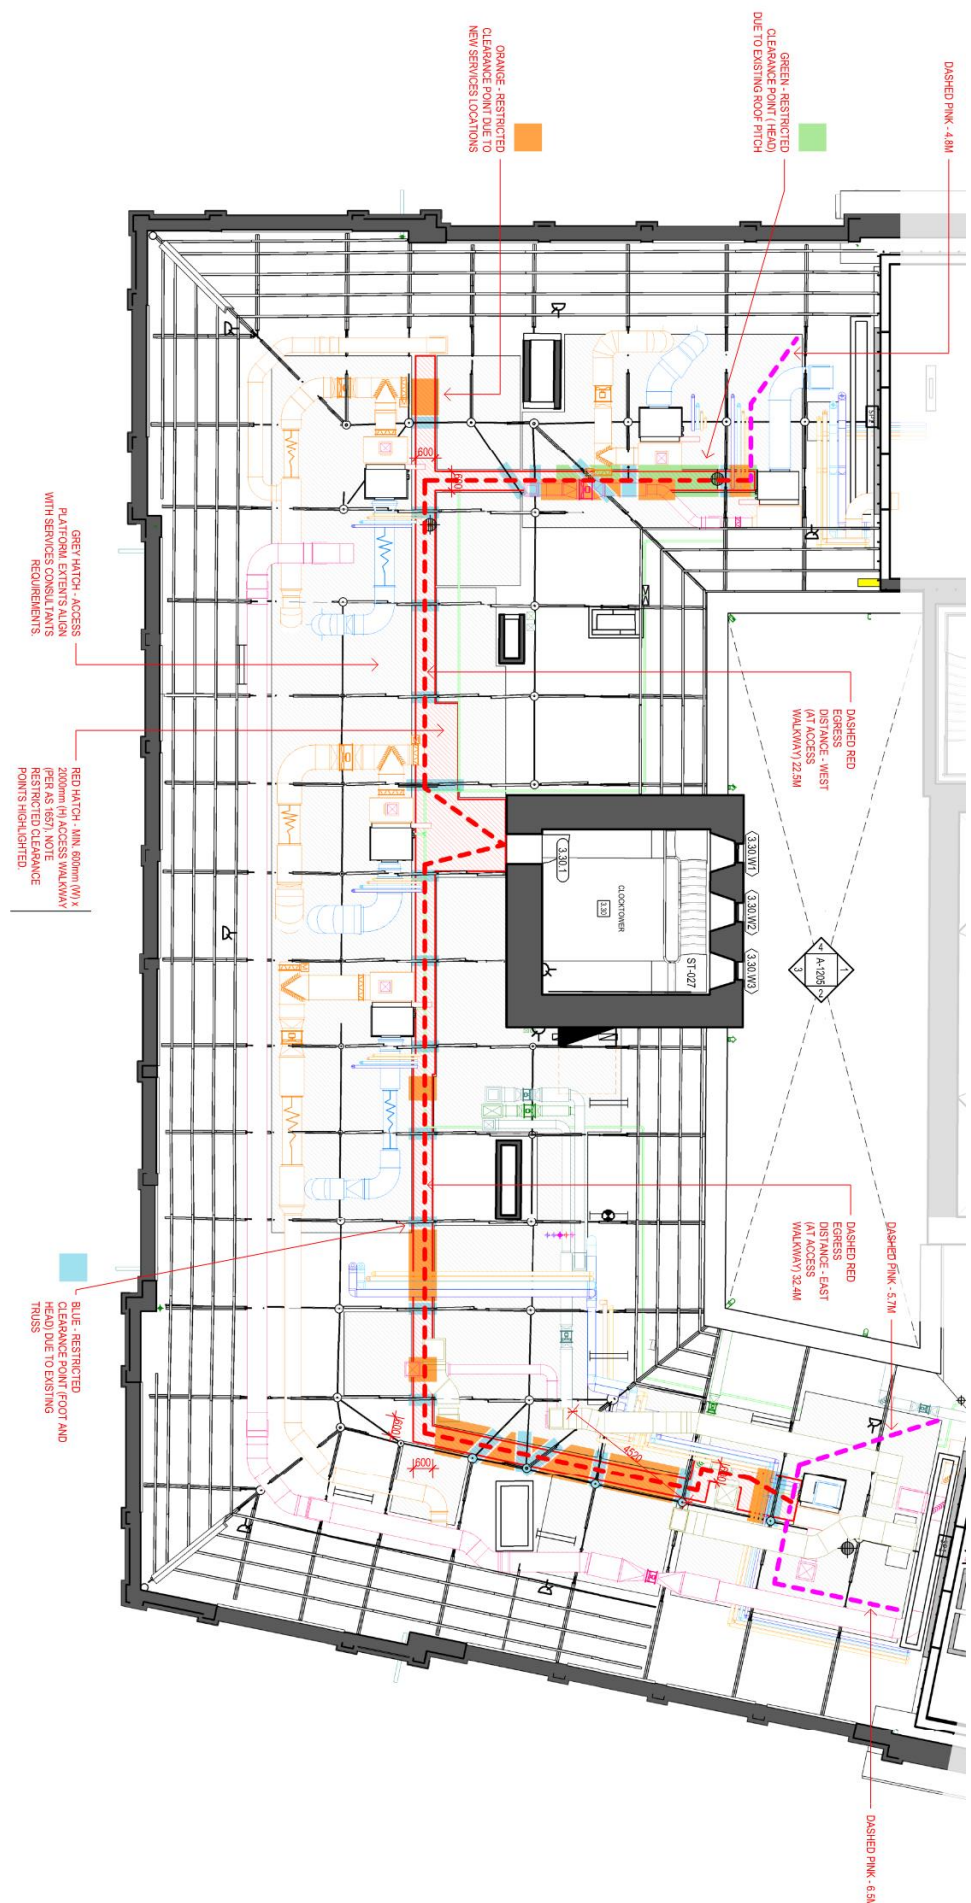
Egress path through southern roof space, indicative of north roof space – Level 03 plan
